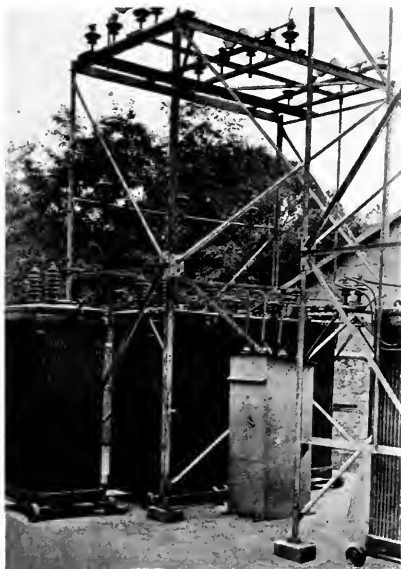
One 1000-kv-a. Unit Showing Spare Transformer and 2200-volt Switch House, Chee Hsin Cement Company, Ltd., Tongshan, North China
